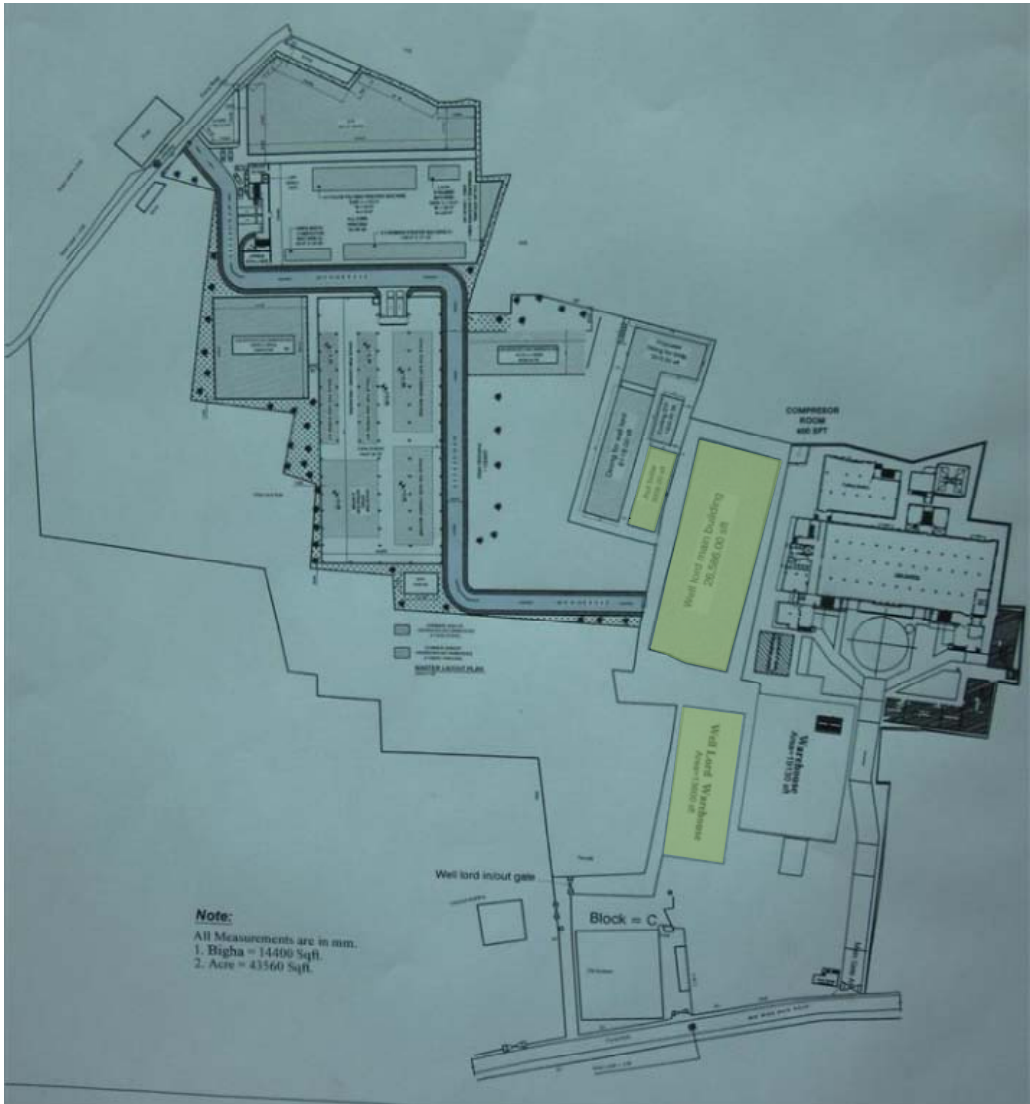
Site plan showing highlighted building of Well Lord Factory.
